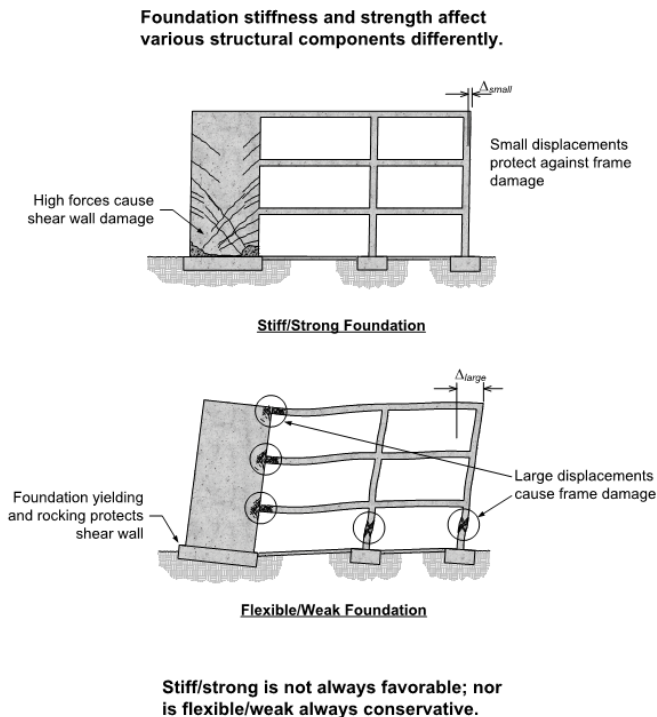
The significant impact of soil flexibility on a reinforced concrete shear wall system (from ATC, 1996).
